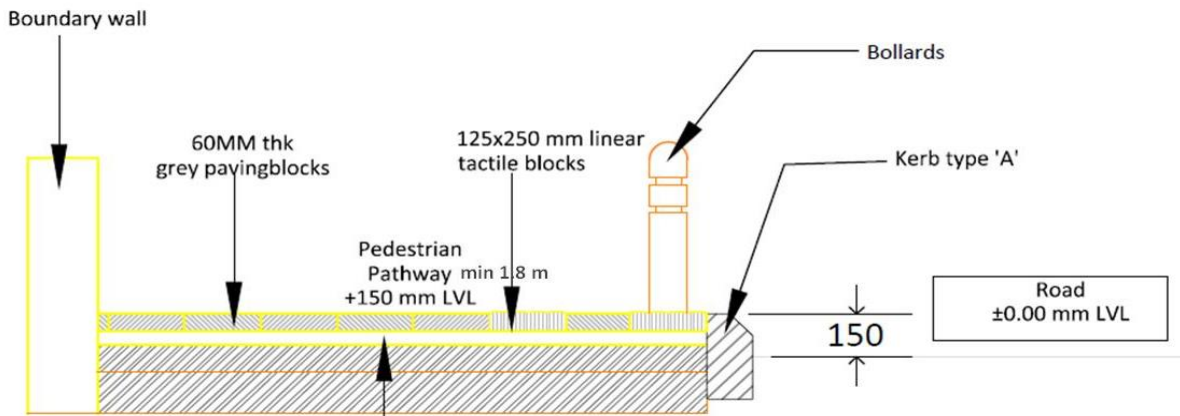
DETAILED CROSS SECTION OF FOOTPATH DESIGN
